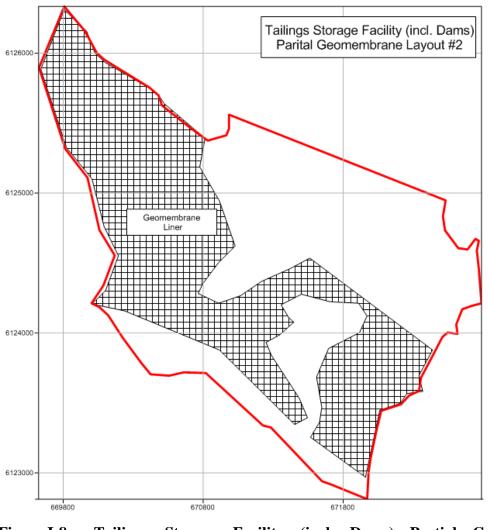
Tailings Storage Facility (incl. Dams) Partial Geomembrane Layout #2
